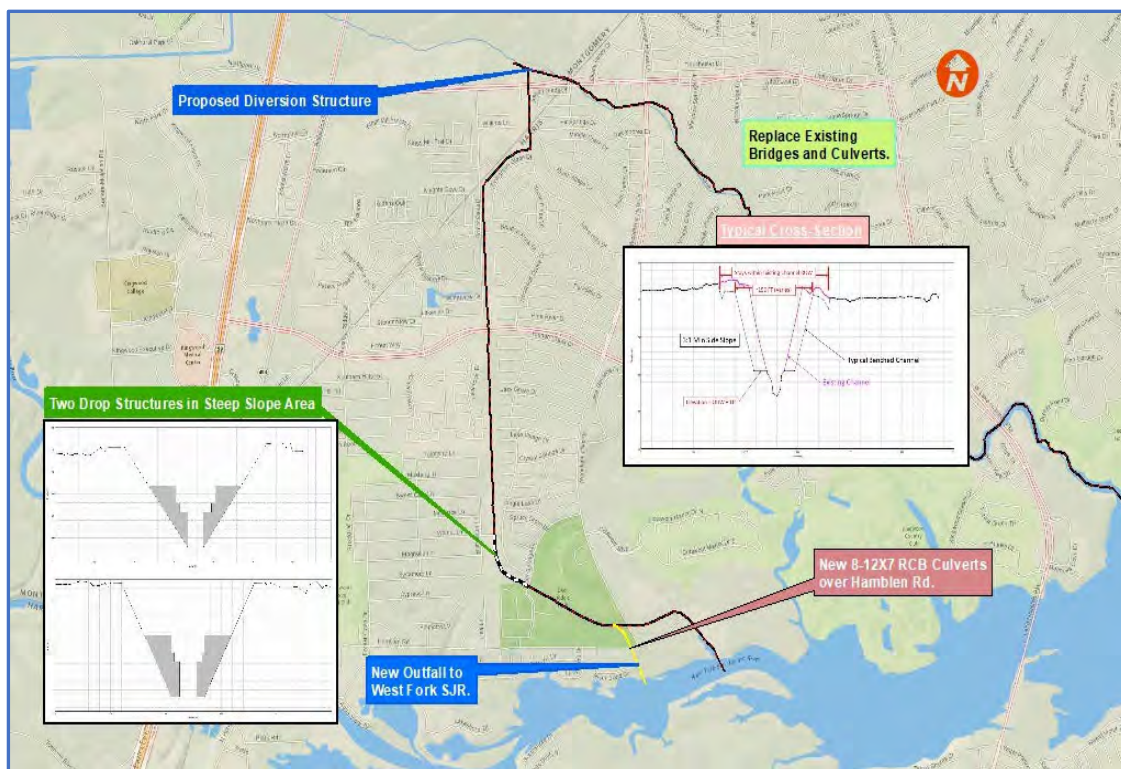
Alternative 2 - Trapezoidal Benched Cross-Section above OHWM
